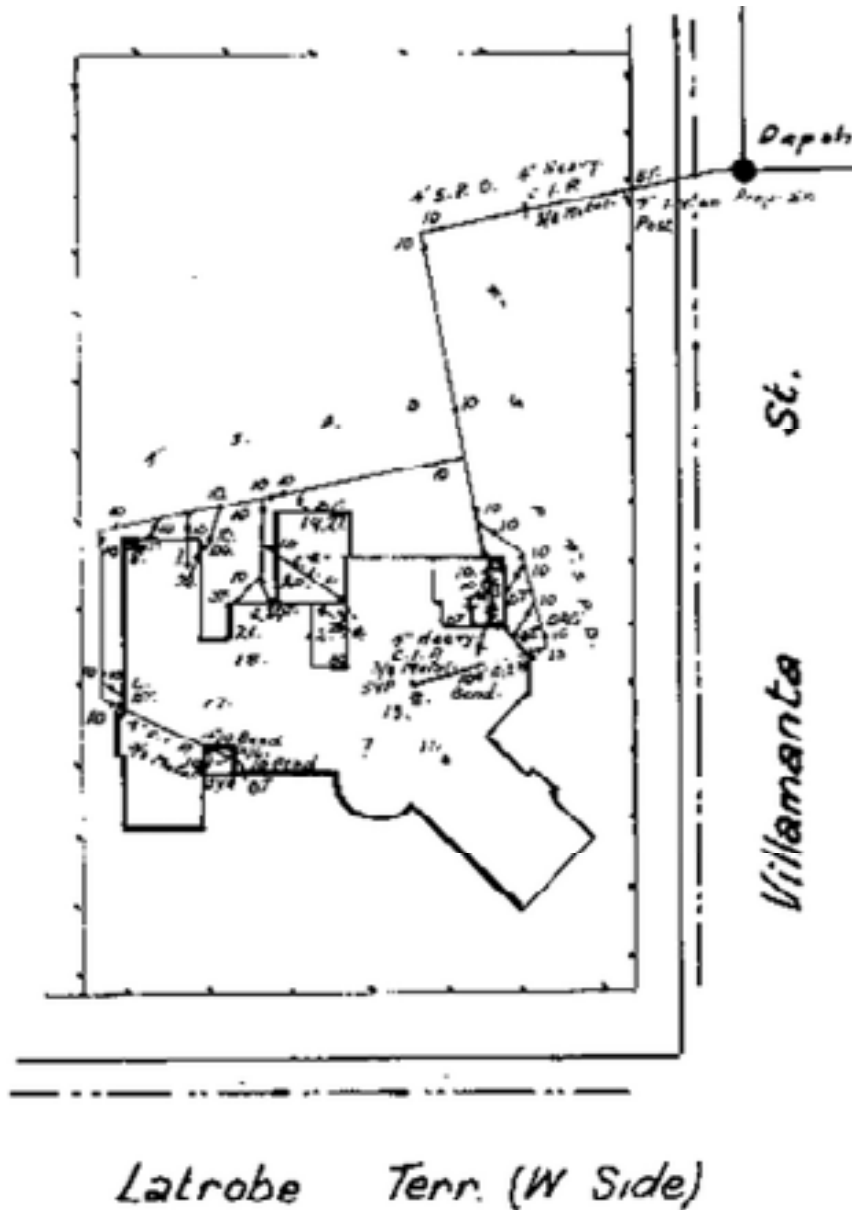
Geelong Waterworks and Sewerage Trust Plan of Drainage GW 9739, amended 15 January 1962. Source: Barwon Water collection.
